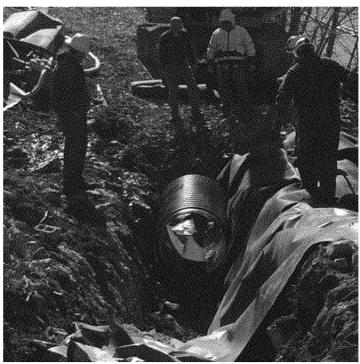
; Taken on 02/24/14 at 14:32 hours by START GN. Sump pipe in trench.
